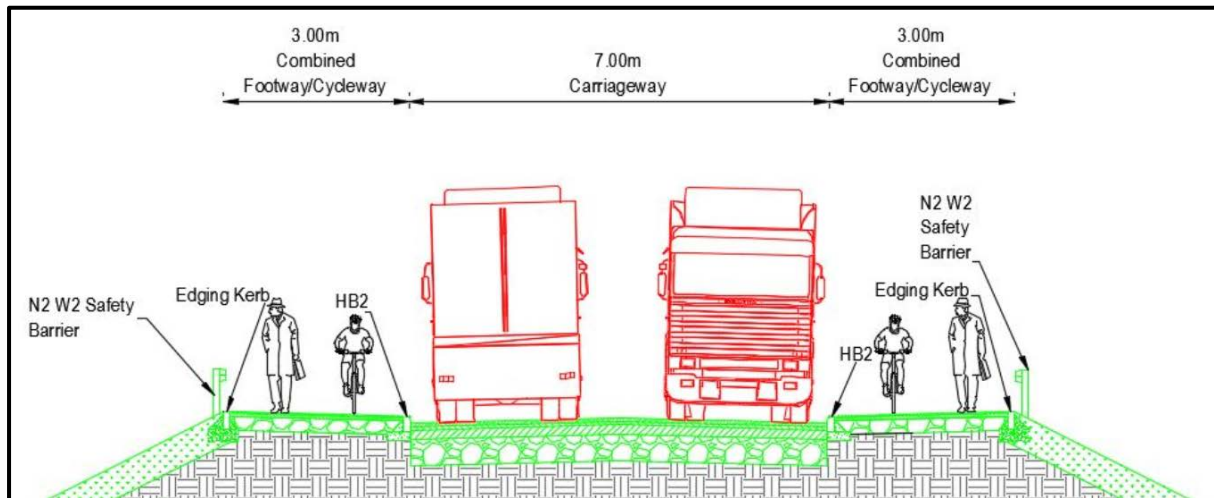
shows a typical cross section of the proposed road network, which includes 1.7 kilometres of proposed walkway / cycleway.
